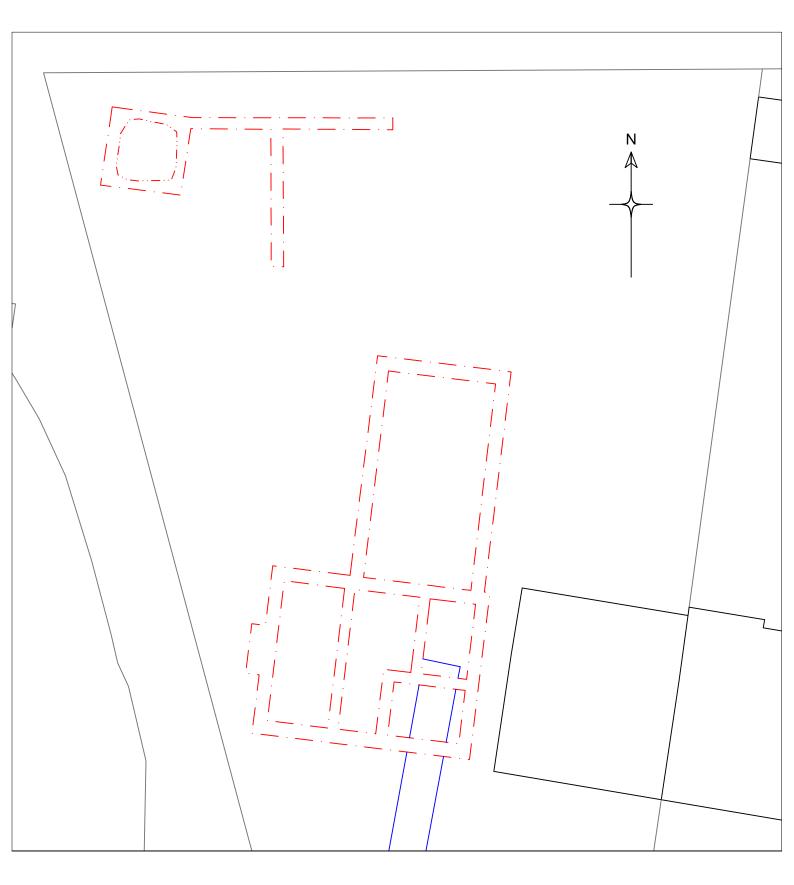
Site Location Plan (extract from Hall Architecture drawing no. 3330 PL20 sheet 01Rev B)
